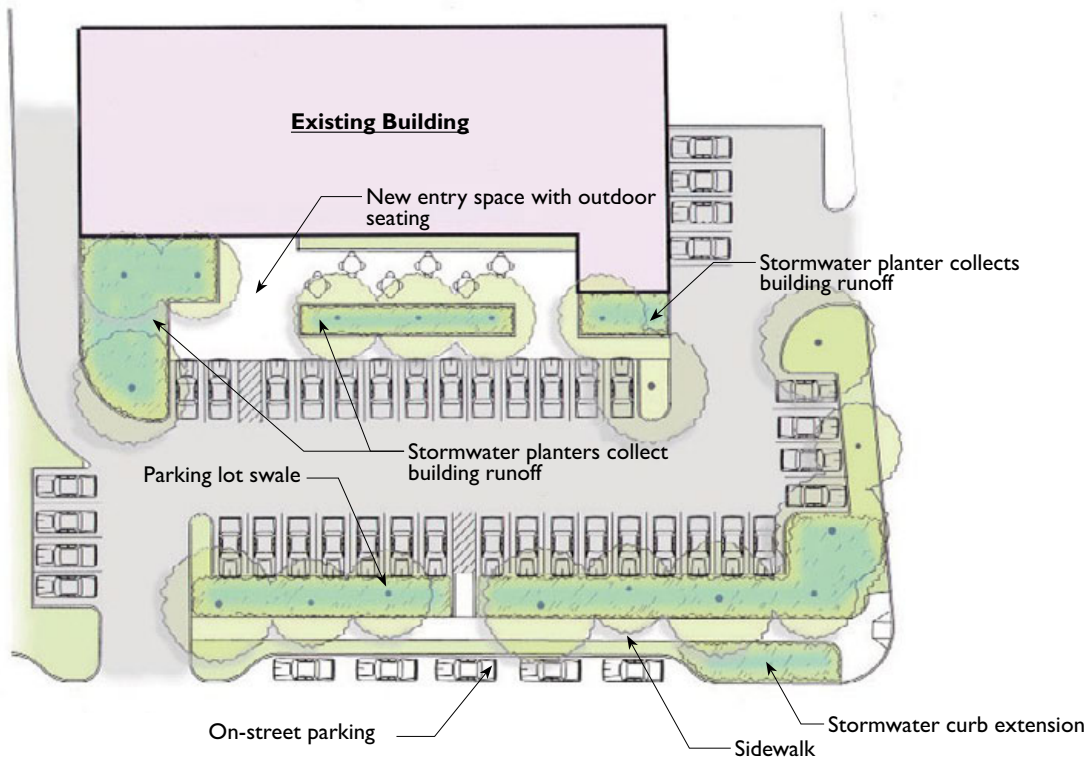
Retrofit potential: A more efficient site design allows several stormwater strategies to be employed on this site, such as a parking lot swale, building planters, and a stormwater curb extension.
